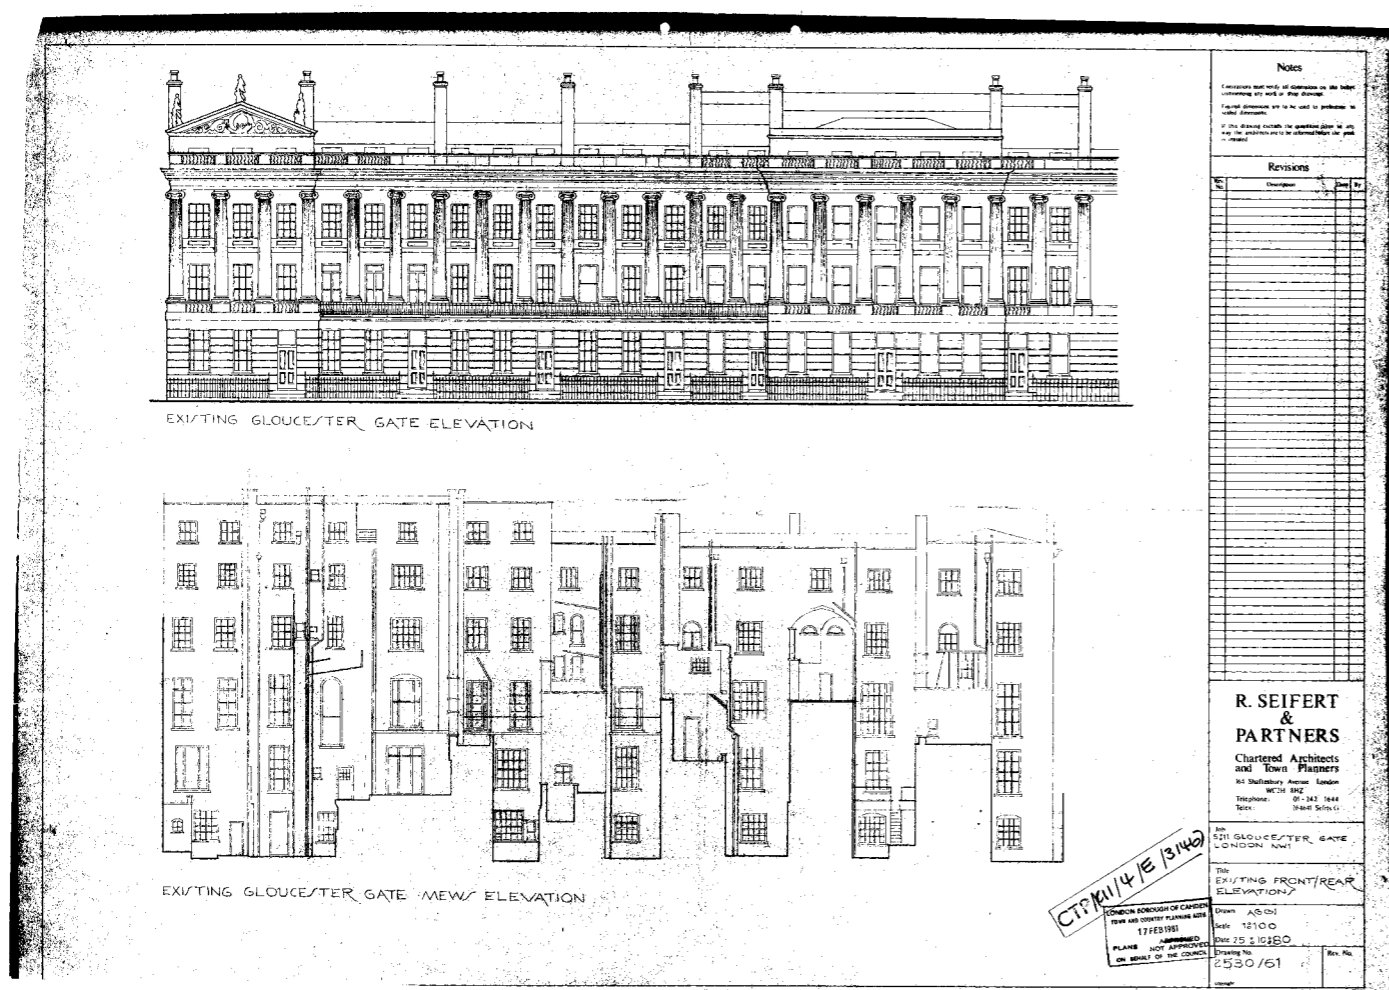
Survey drawing of external elevations at 8 Gloucester Gate, 1981.
